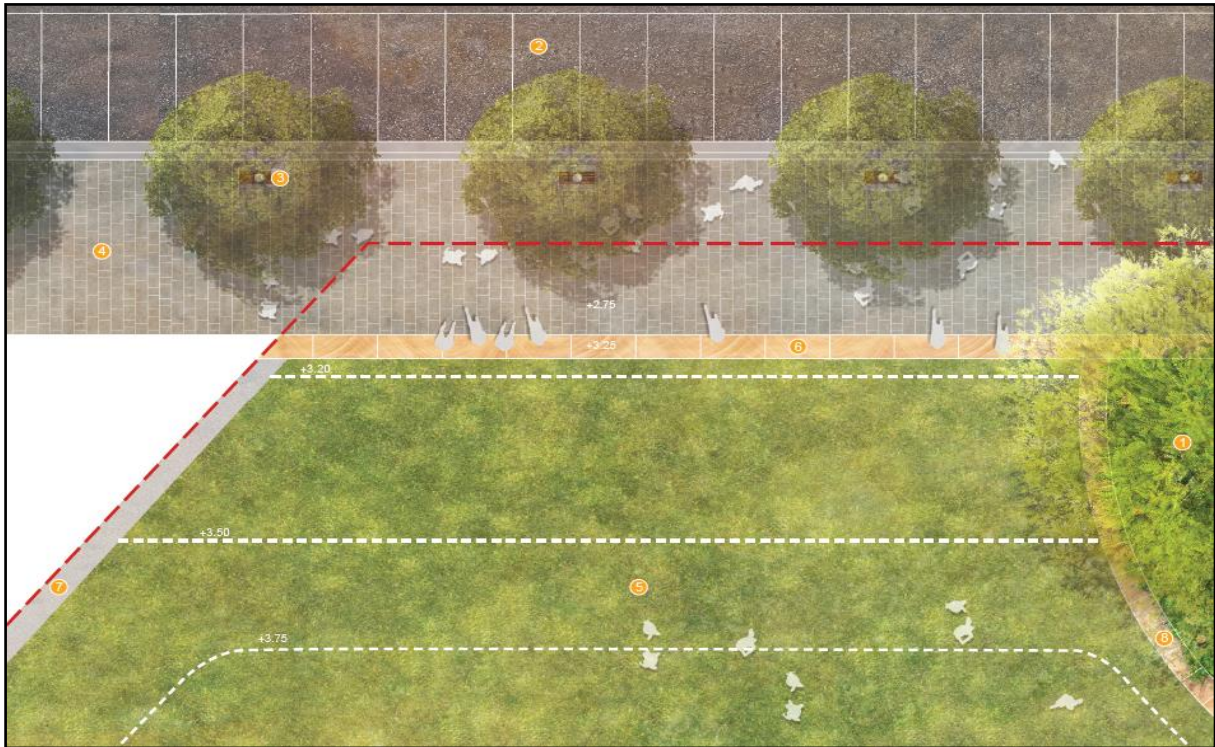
| A site plan of the interim design solution for the interface between Hickson Road and Hickson Park
